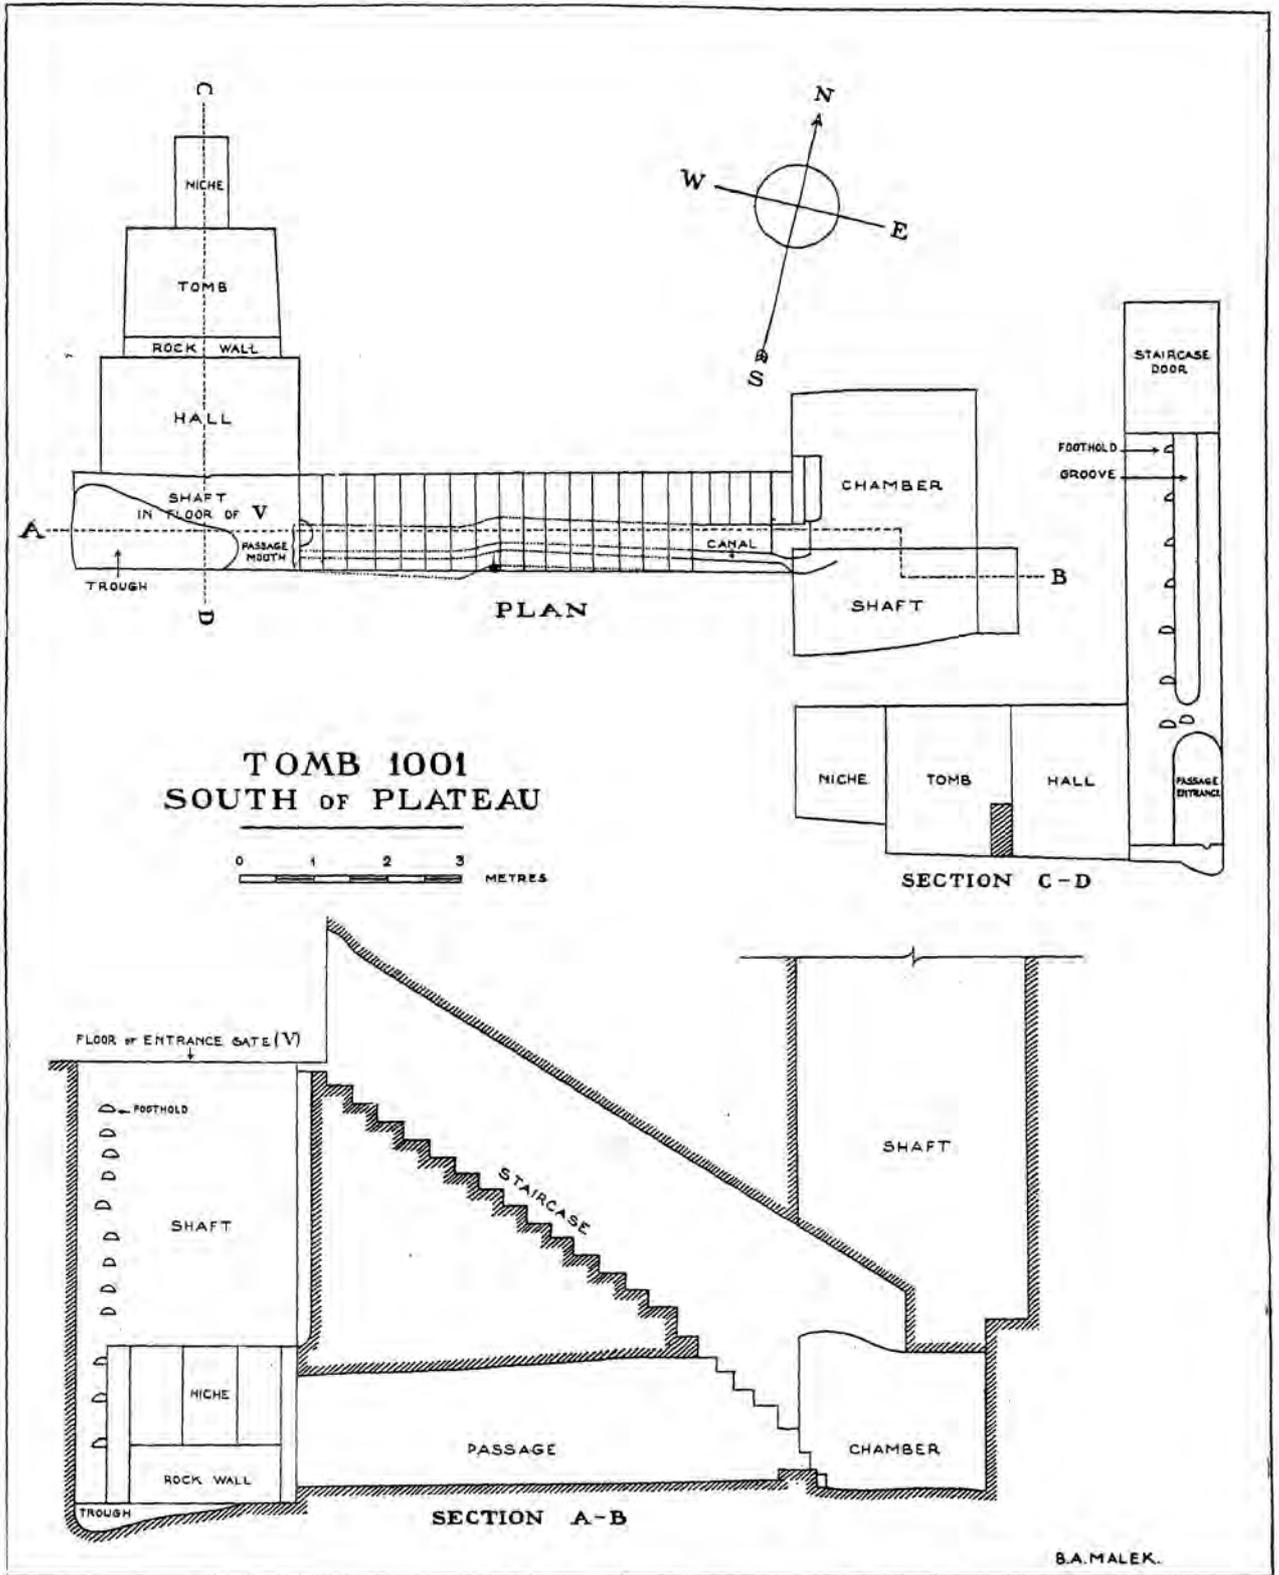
Plan and section of tomb 1001. The plan has been digitized as Figure 88 (Rowe 1942: PLXIII).
